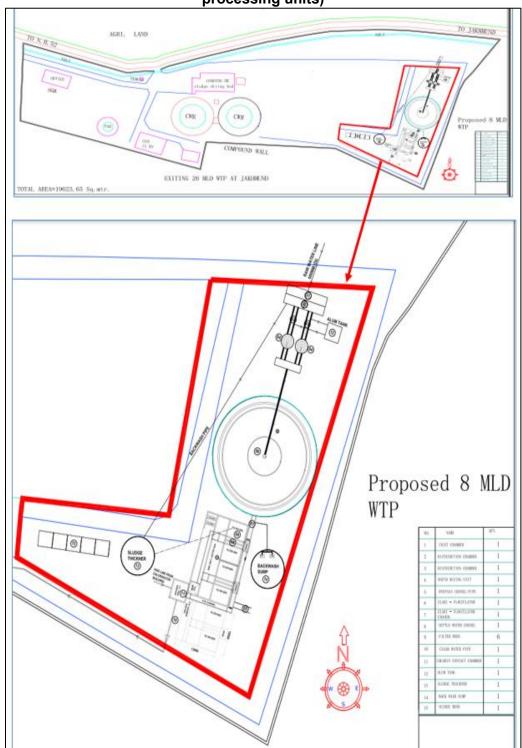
Layout of Proposed WTP in Jakhmund, Bundi (Showing Backwash and Sludge processing units)
